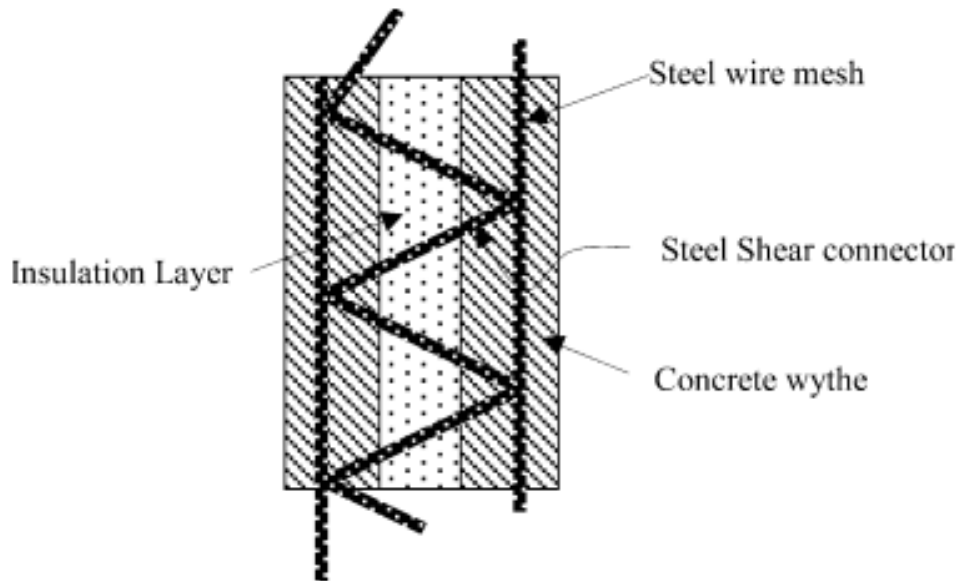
2: Precast Sandwich Panel with truss shaped shear connector (Benayoune, 2007)
